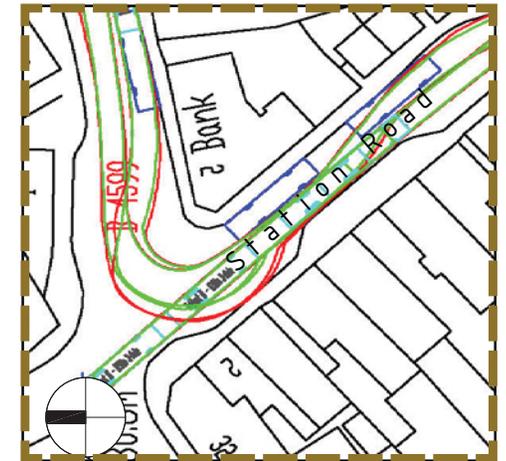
Option 3 constraint : Brecon Road and Station Road
